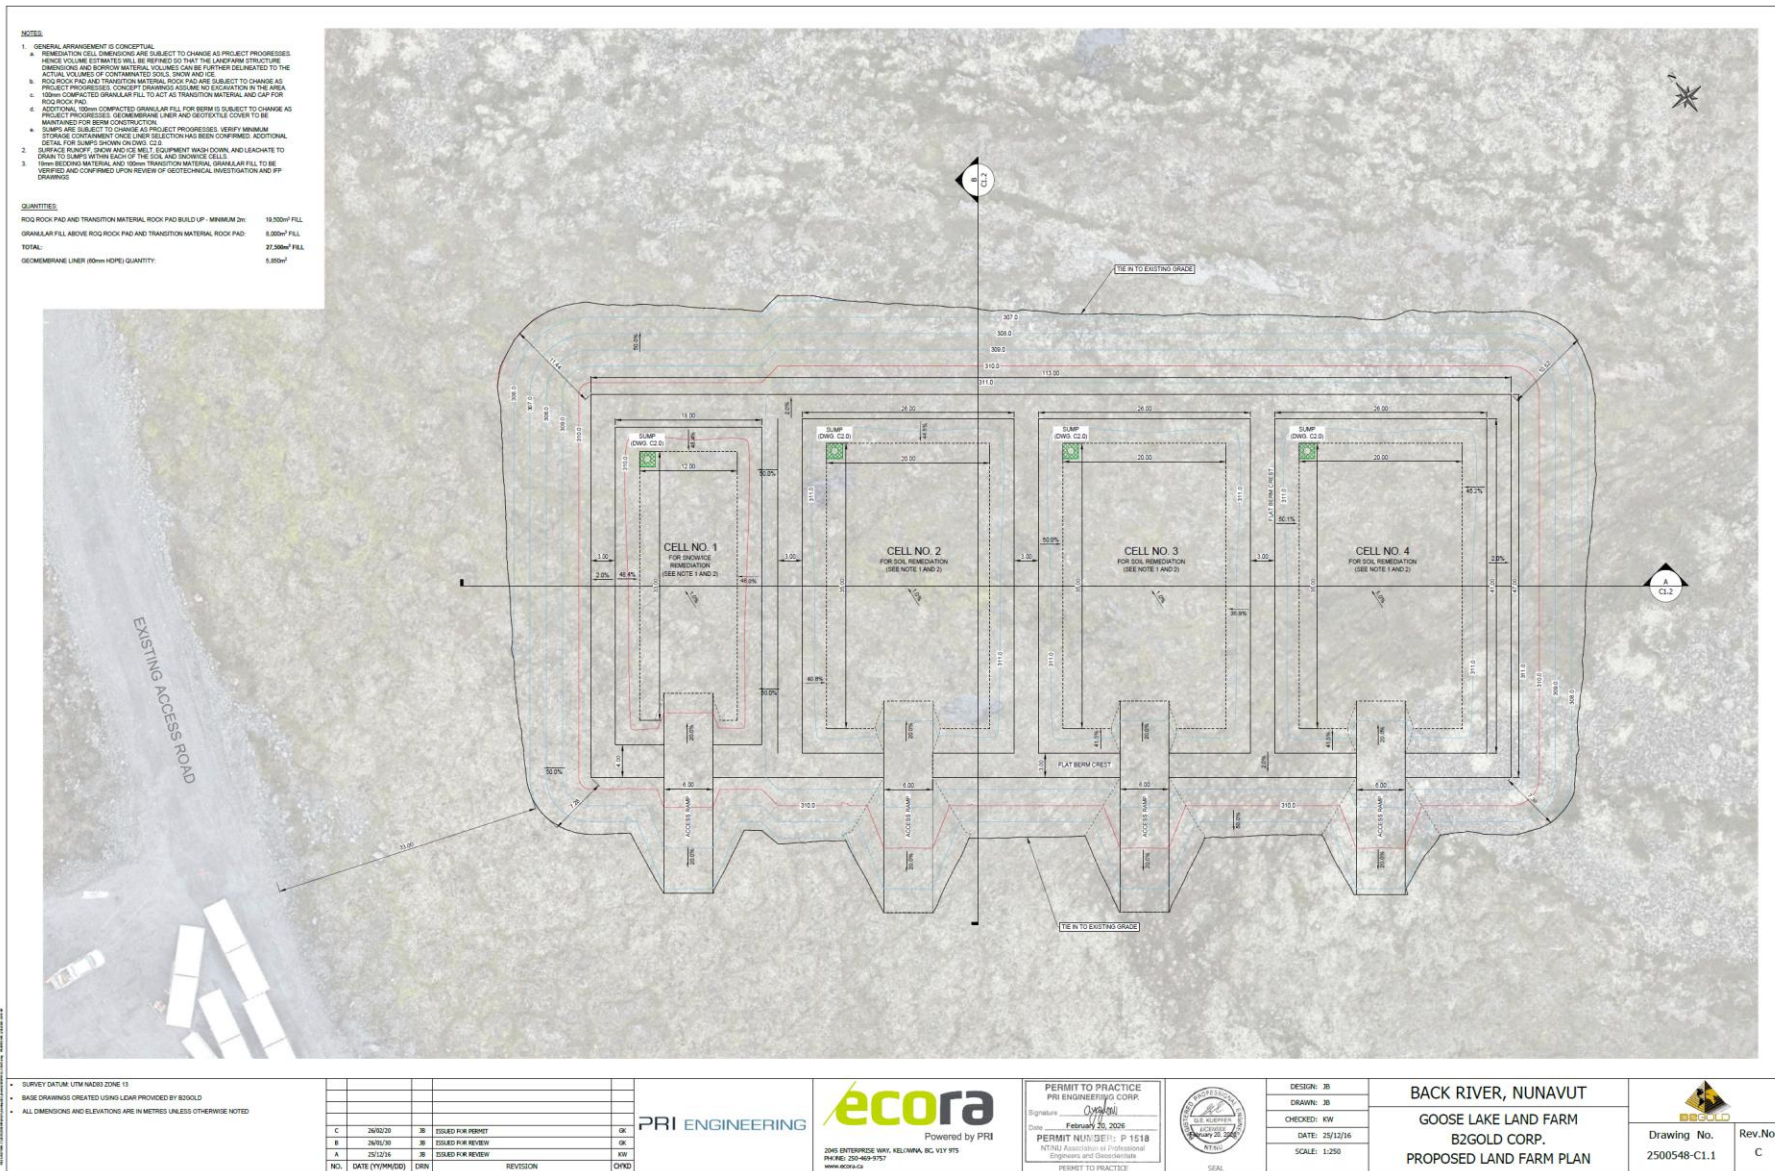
Goose Mine Land Farm / Soil Treatment Facility Proposed Plan
